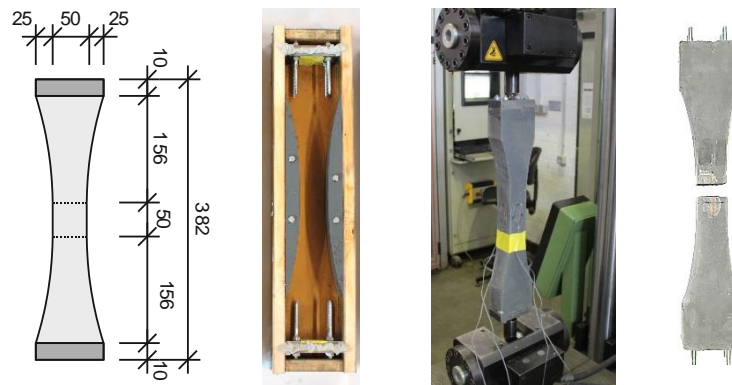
Formwork, test set-up of dumbbell UHPC specimens and after testing
